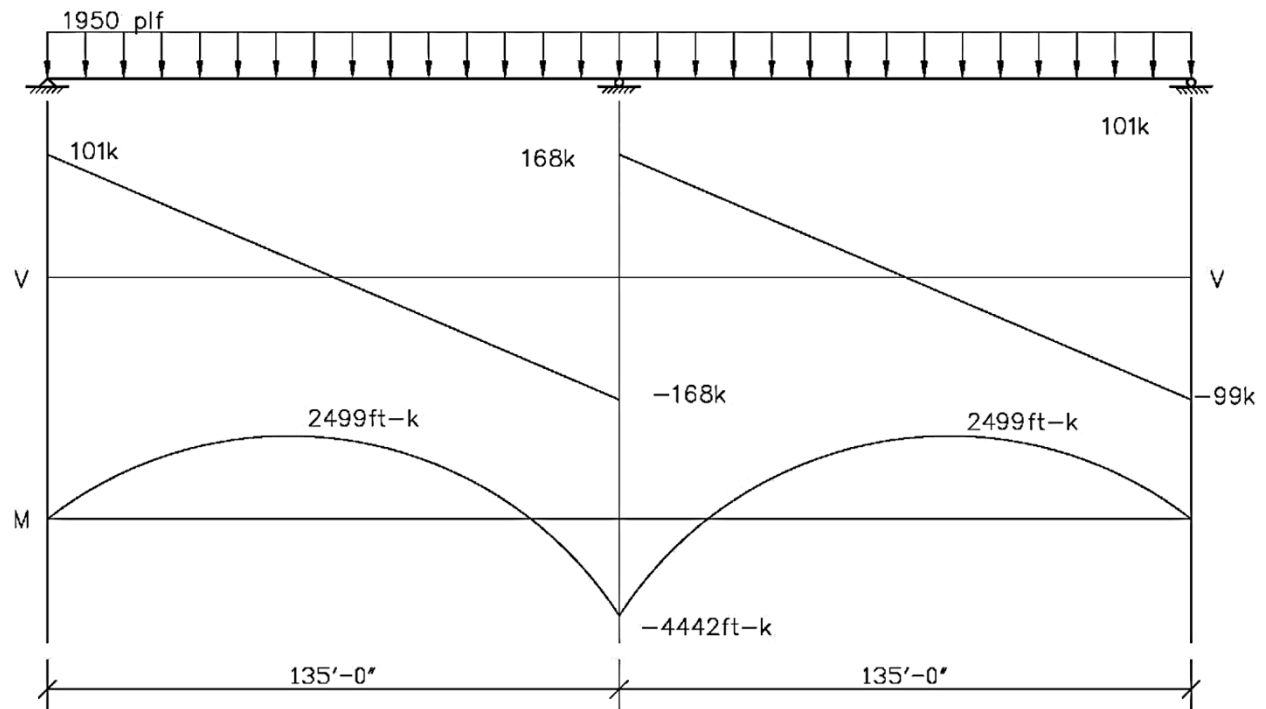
Girder Capacity Shear and Moment Envelope
